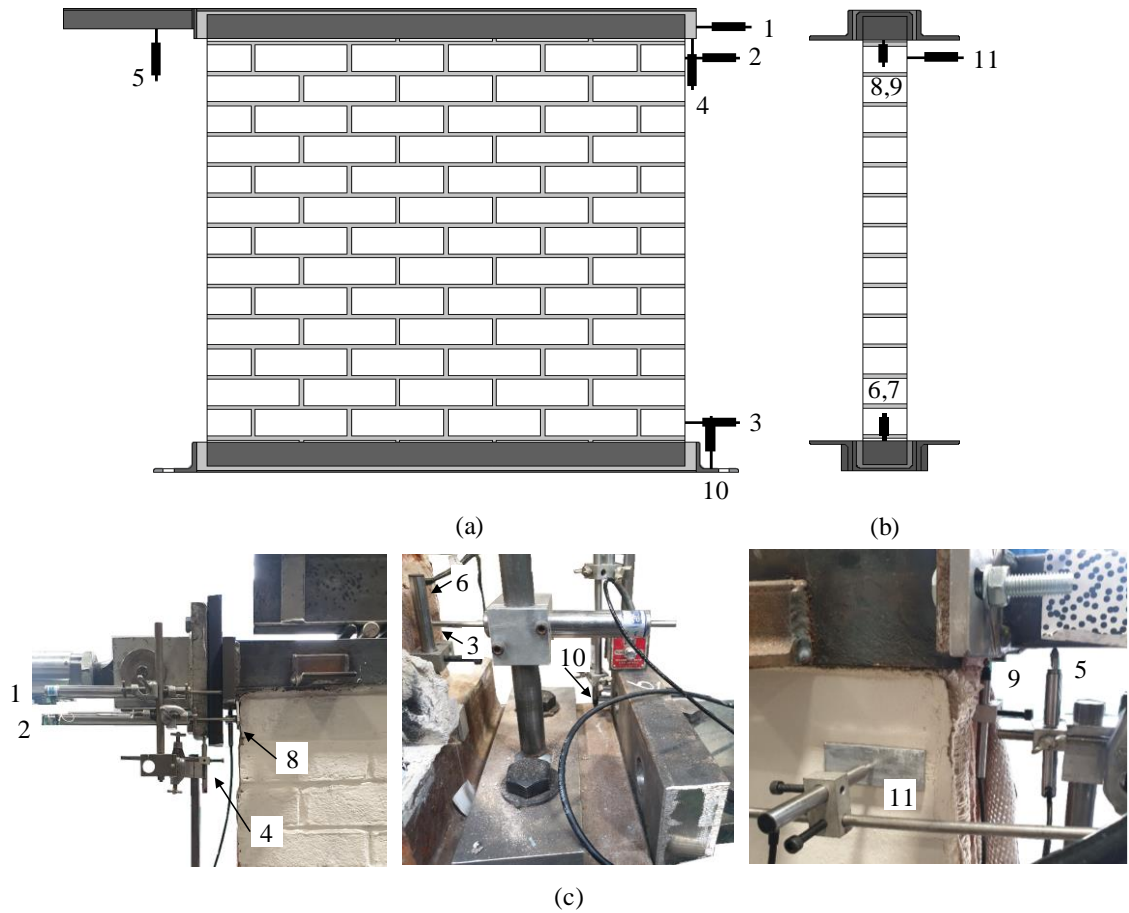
Instrumentation layout: (a) front view; (b) side view; (c) mounting details
